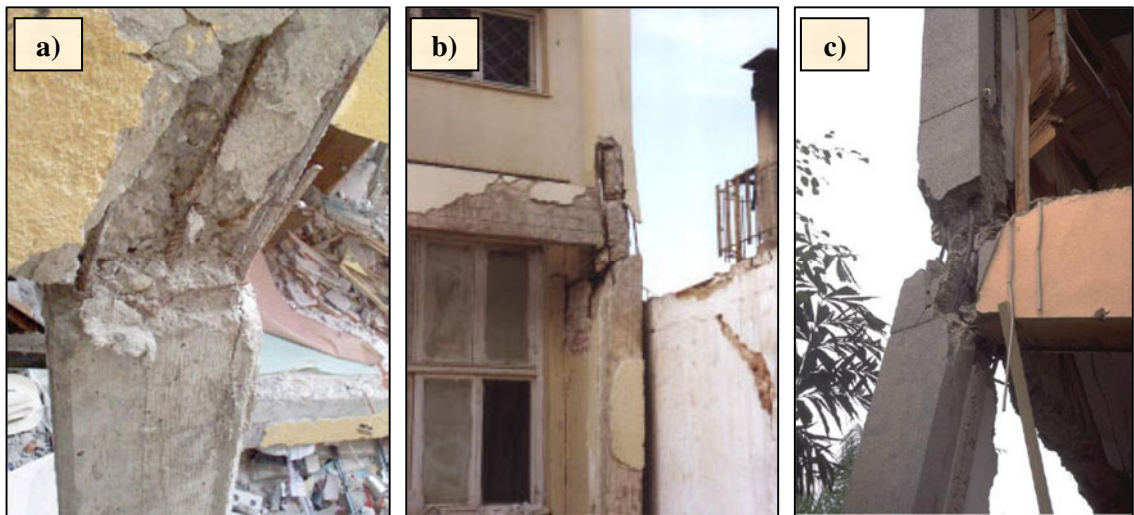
Reinforced concrete beam-column joint damage due to inadequate detailing in a) the June 15, 1999 Tehuacan, Mexico earthquake (Pantelides et al. 2002), b) the Athens, Greece, earthquake of September 7, 1999 (EERI 1999b), and c) a corner joint (Hassan, 2009)
